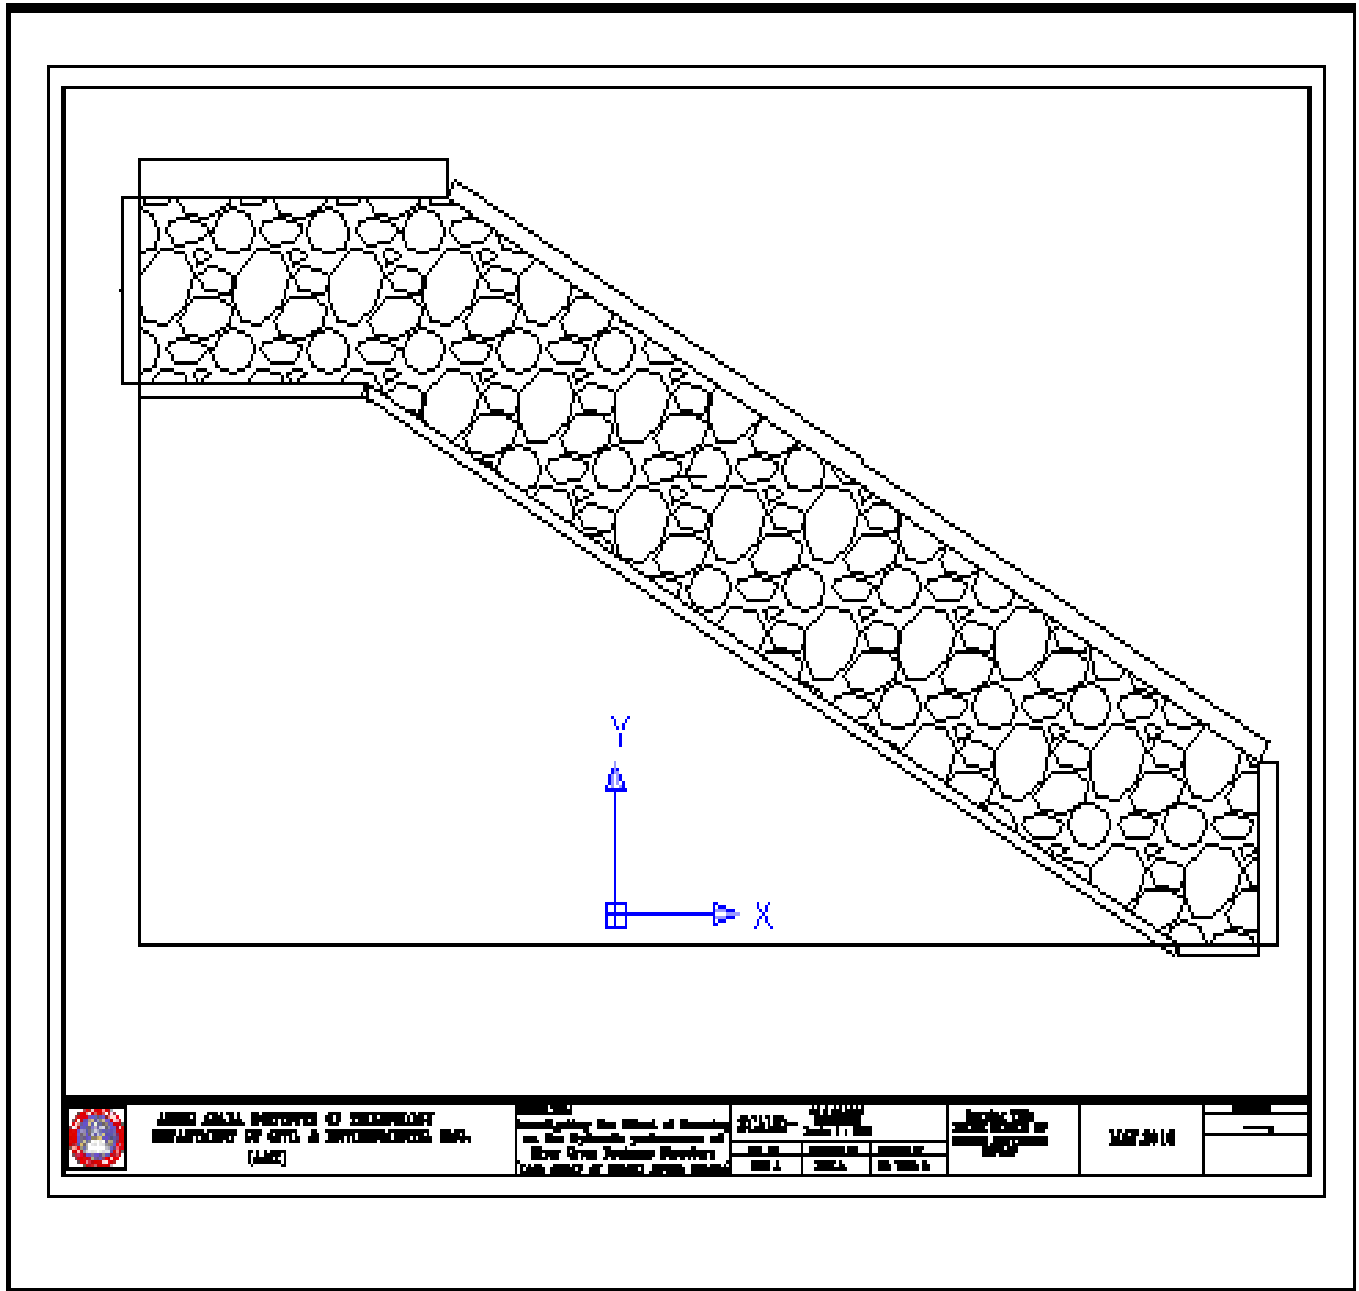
Rough Sketch of Riprap on Abutment of Ginchi Awash Bridge.
